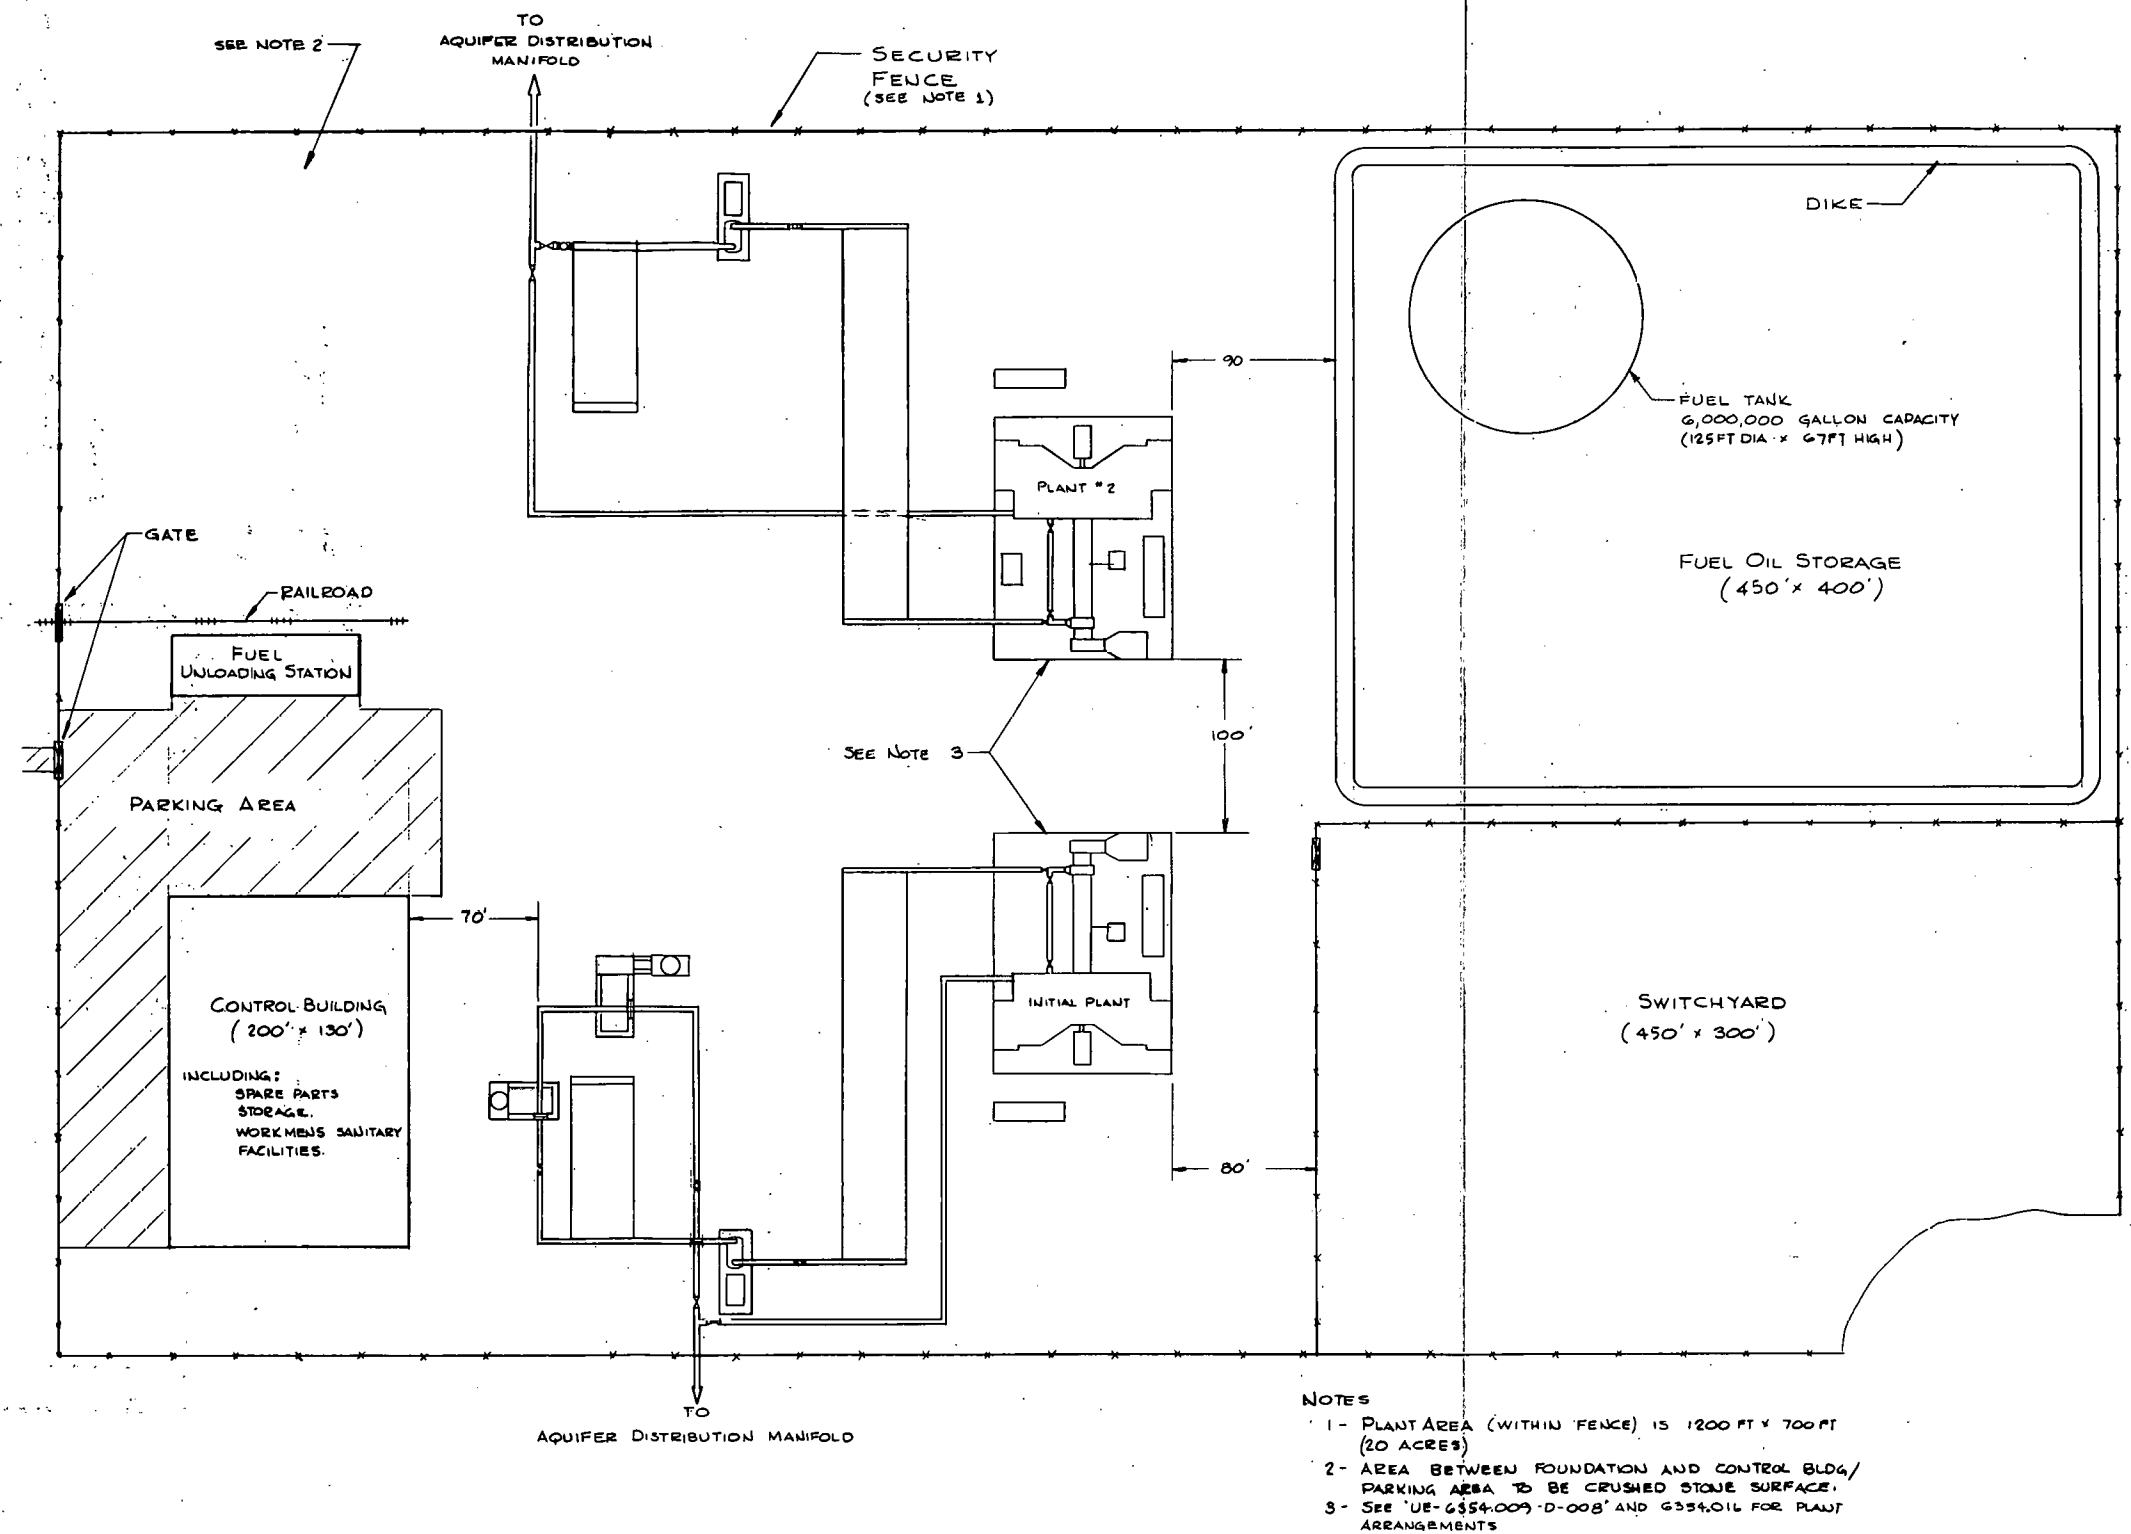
Partial Plot Plan -- 300 MW_e Cluster with Control Building
